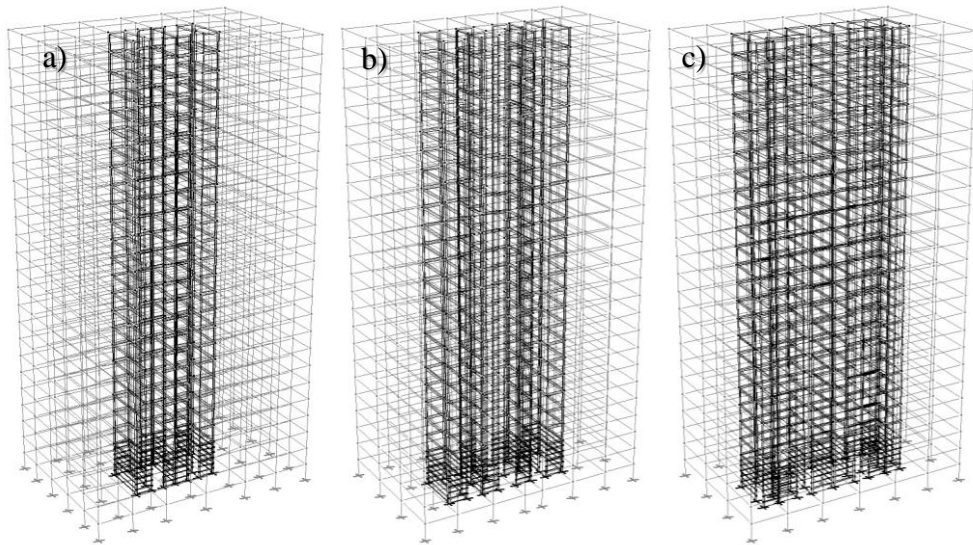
Analytical structural models of the second group buildings in Perform 3D. (a) Building 2A, (b) Building 2B and (c) Building 2C
